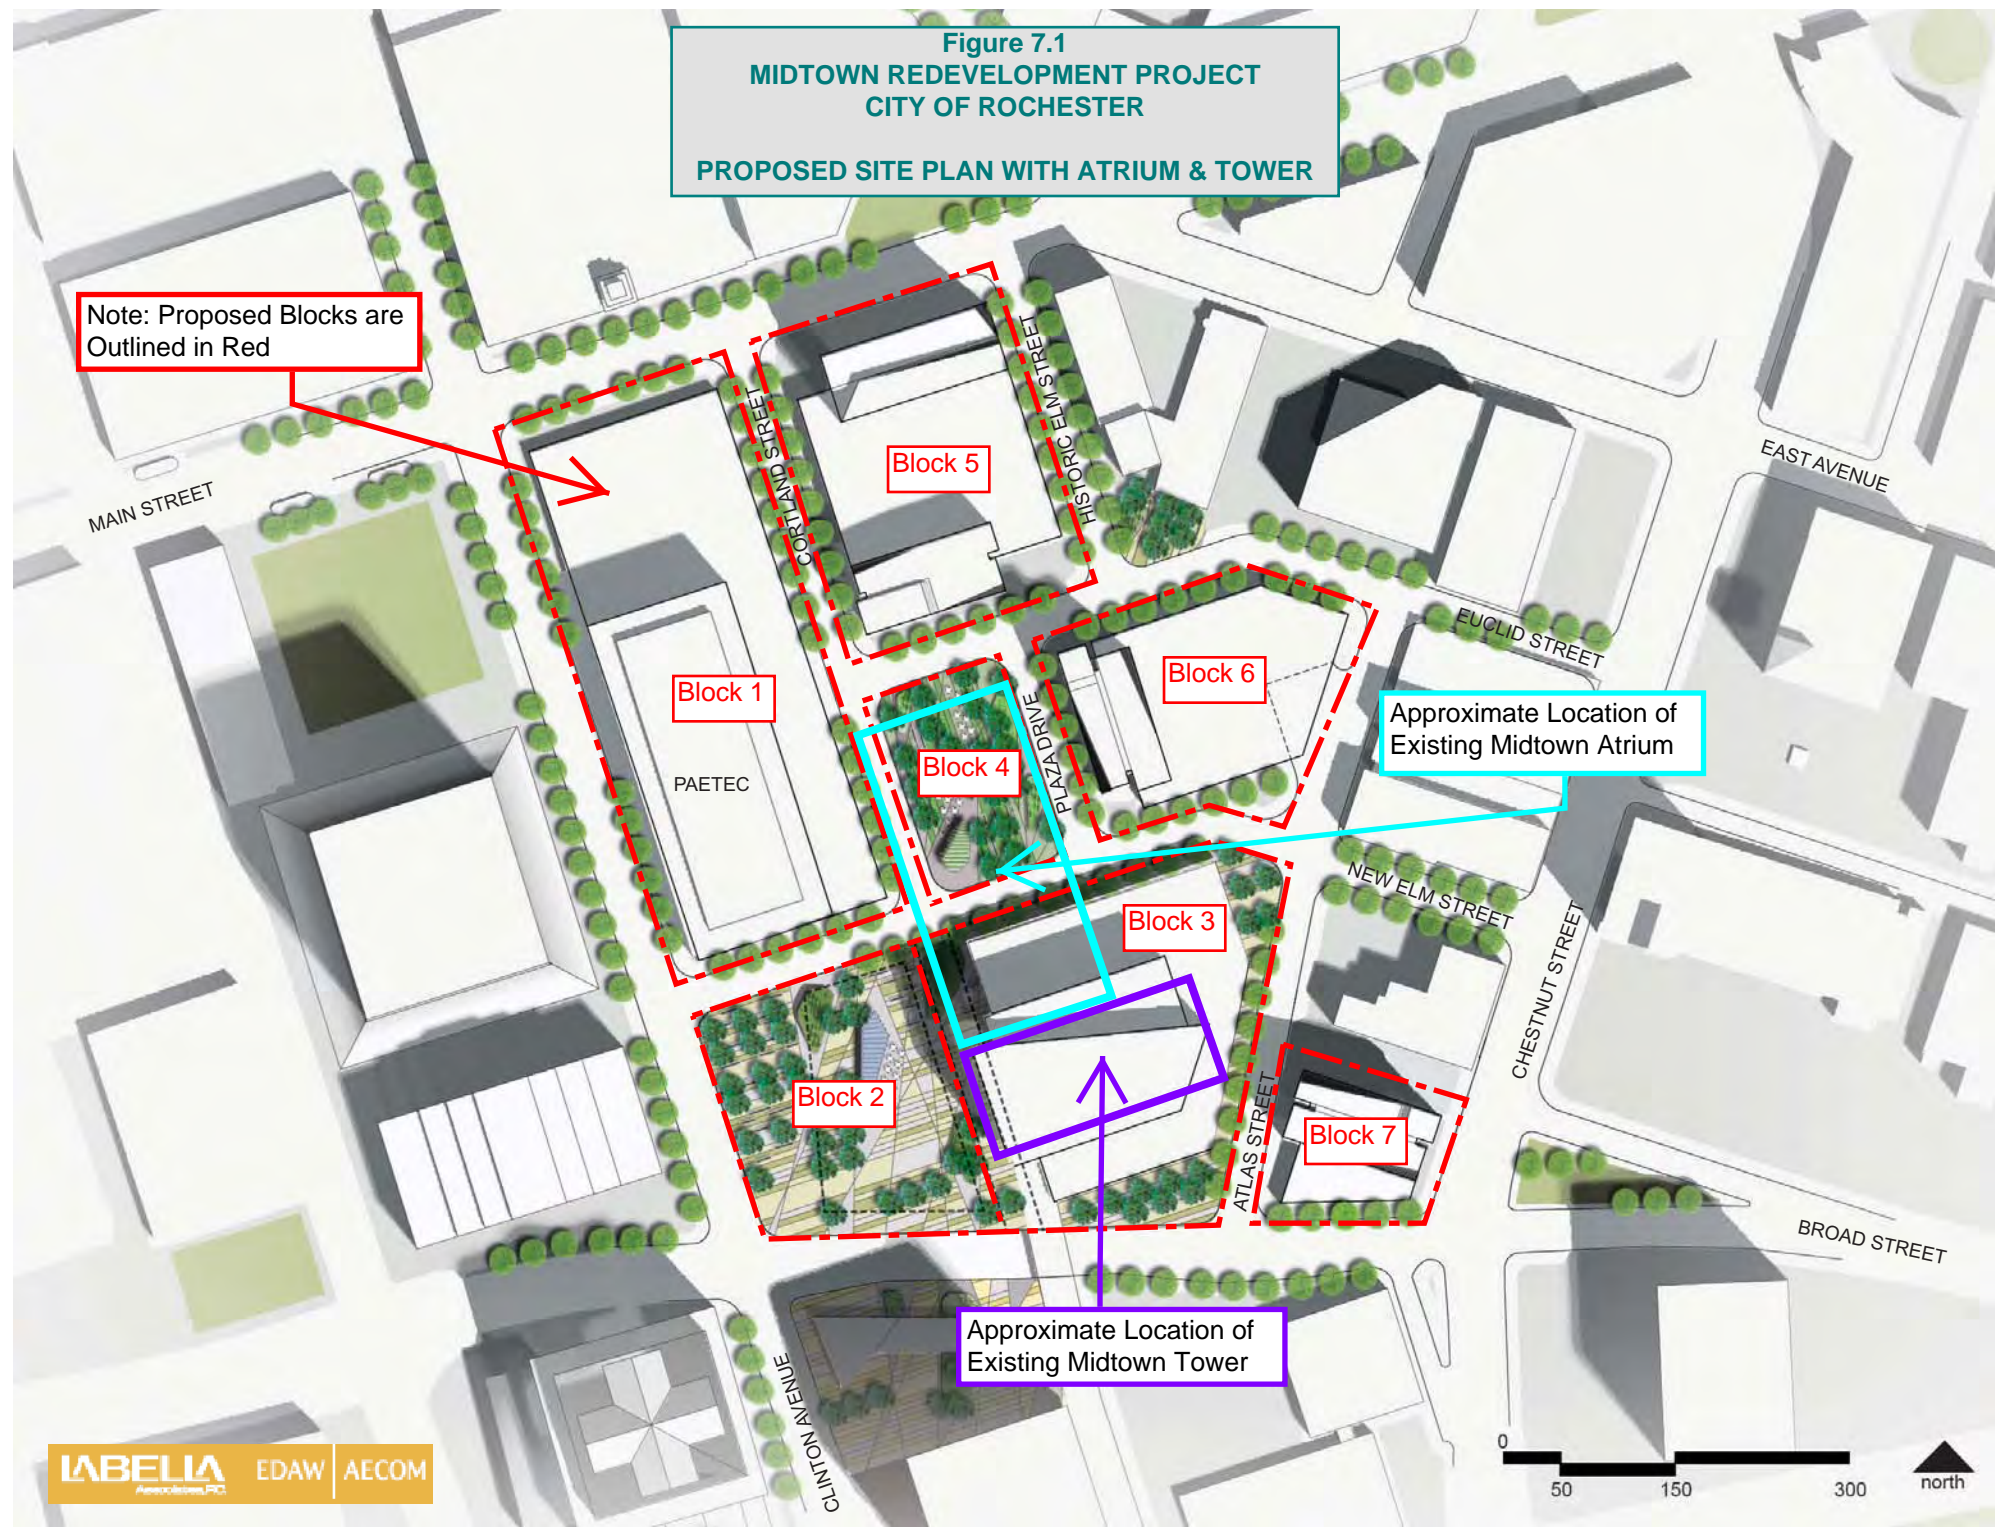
Proposed Site Plan with Tower, Atrium denoted
